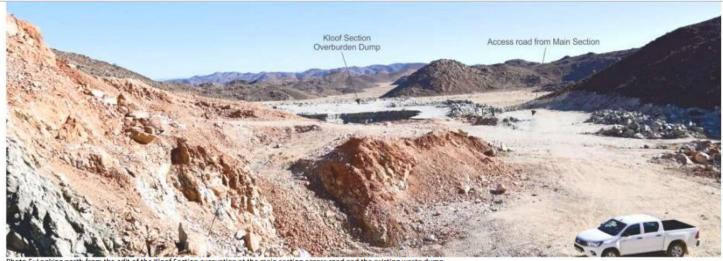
Looking north from the adit of the Kloof Section excavation at the main section access road and the existing waste dump
